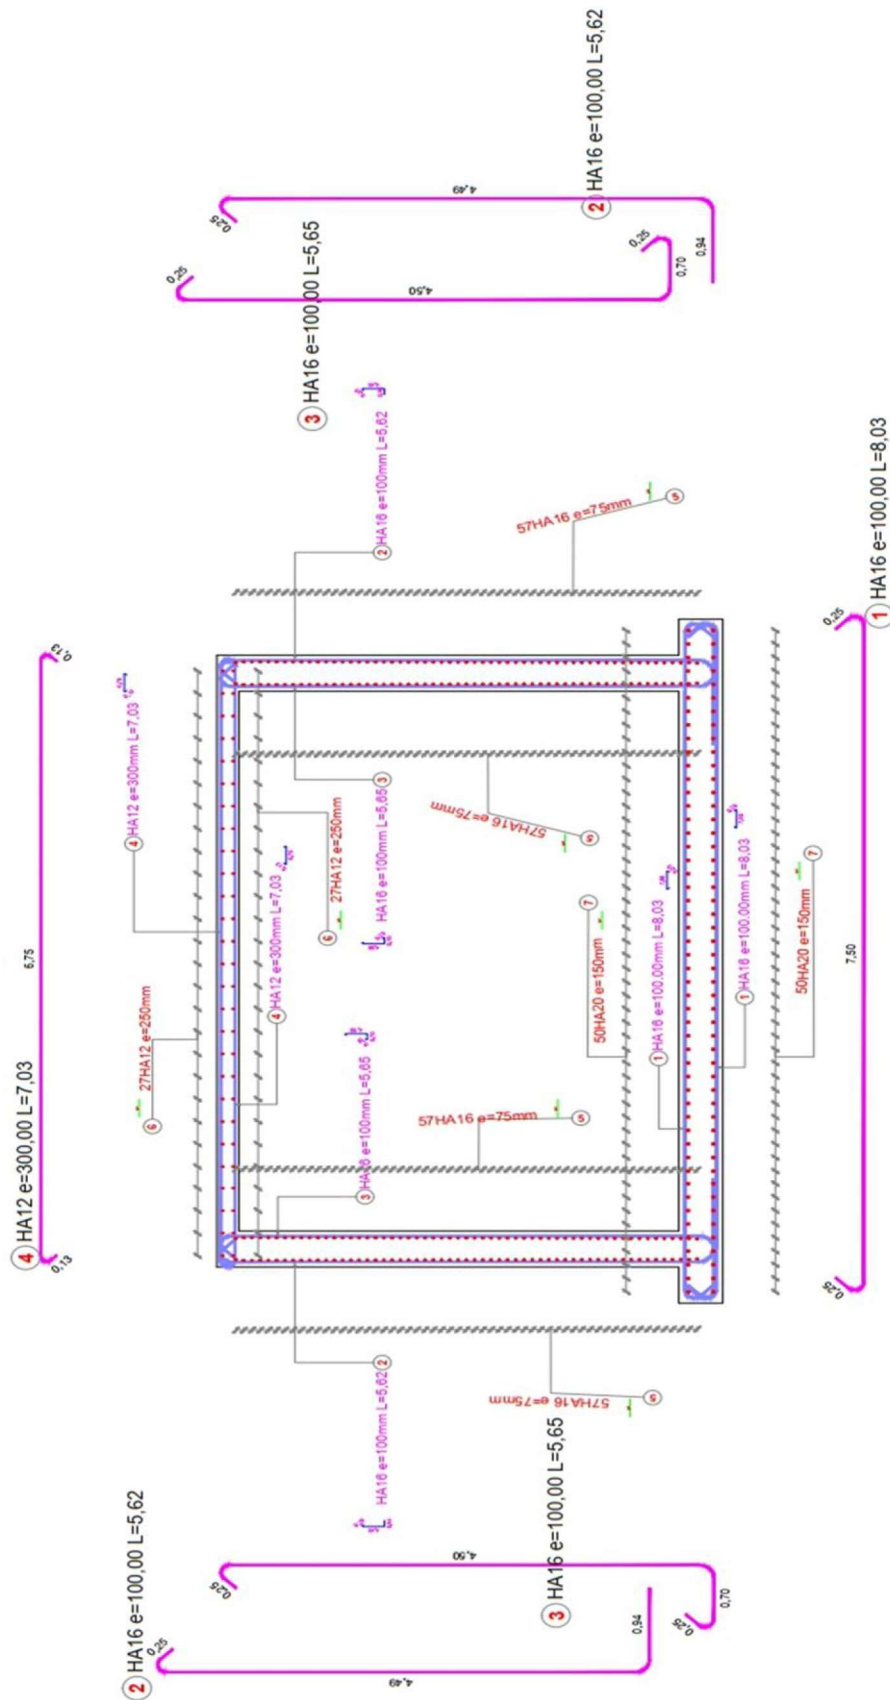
11. Reinforcement plan of CUT B-B (Longitudinal view)
